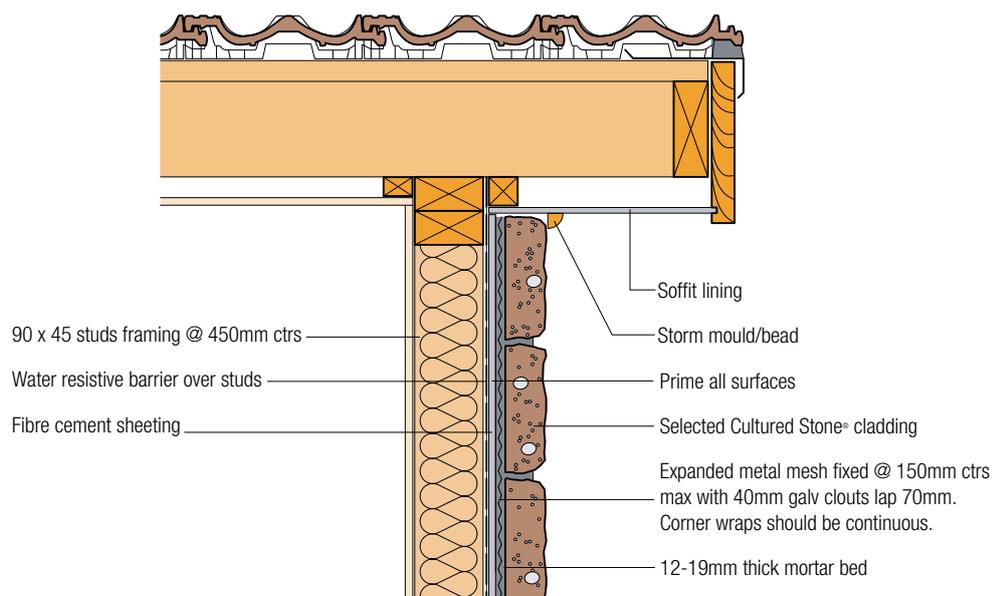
Typical Raking Eave - Section (Dwg # CS-09.02)
